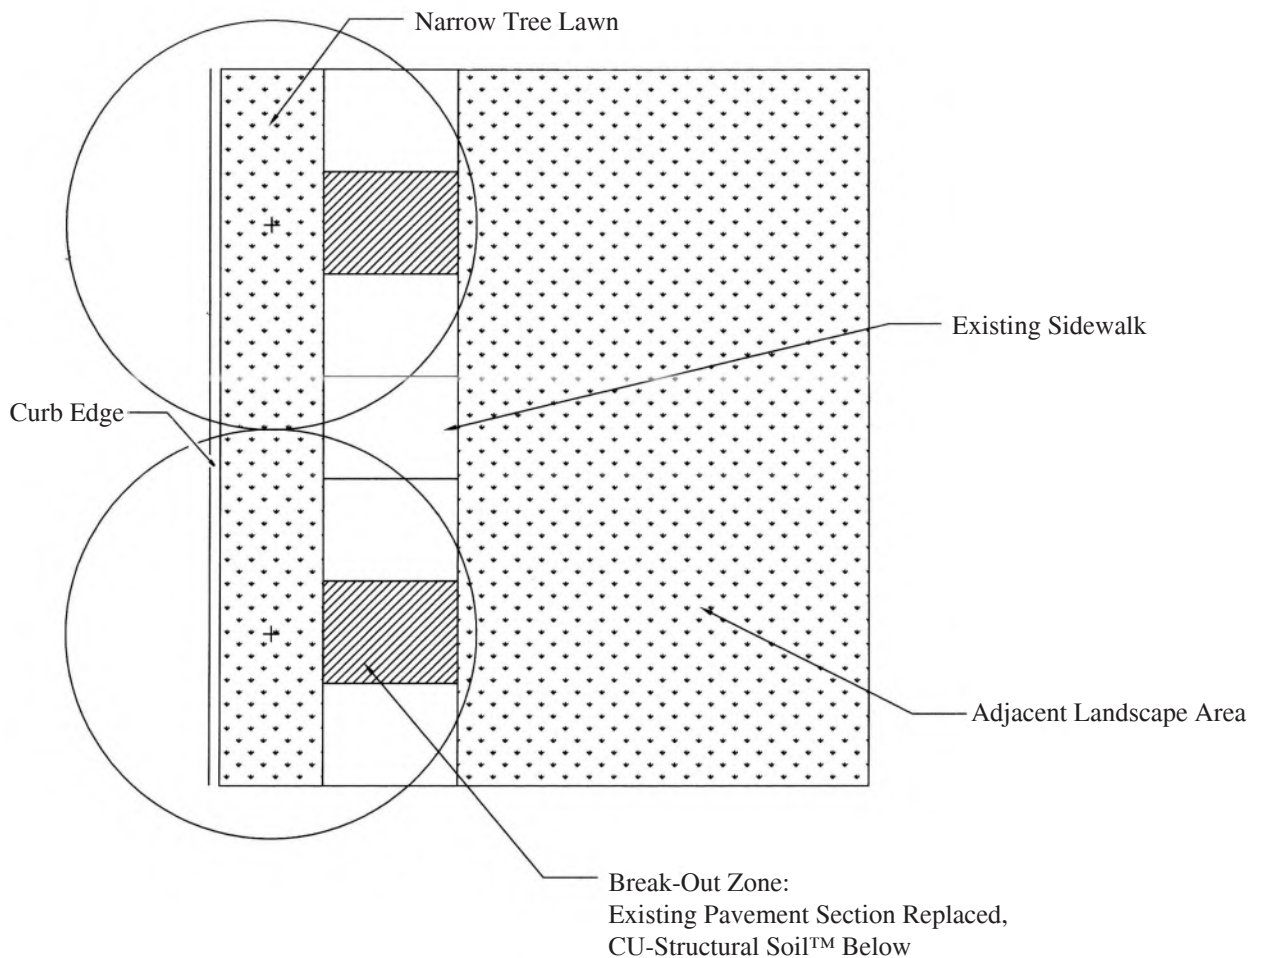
Plan view of retrofitted CU-Structural Soil™ break-out zone
